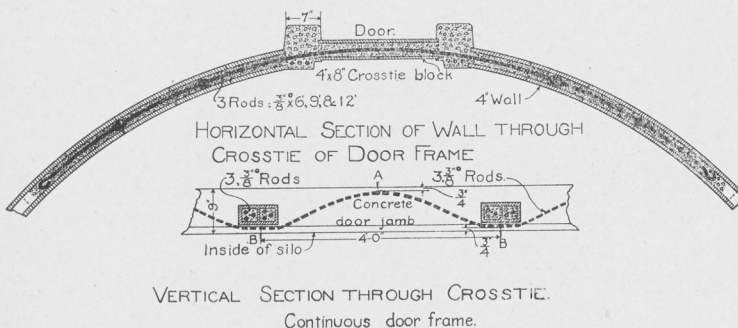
Section of wall and Crosstie Continuous Door Frame.
